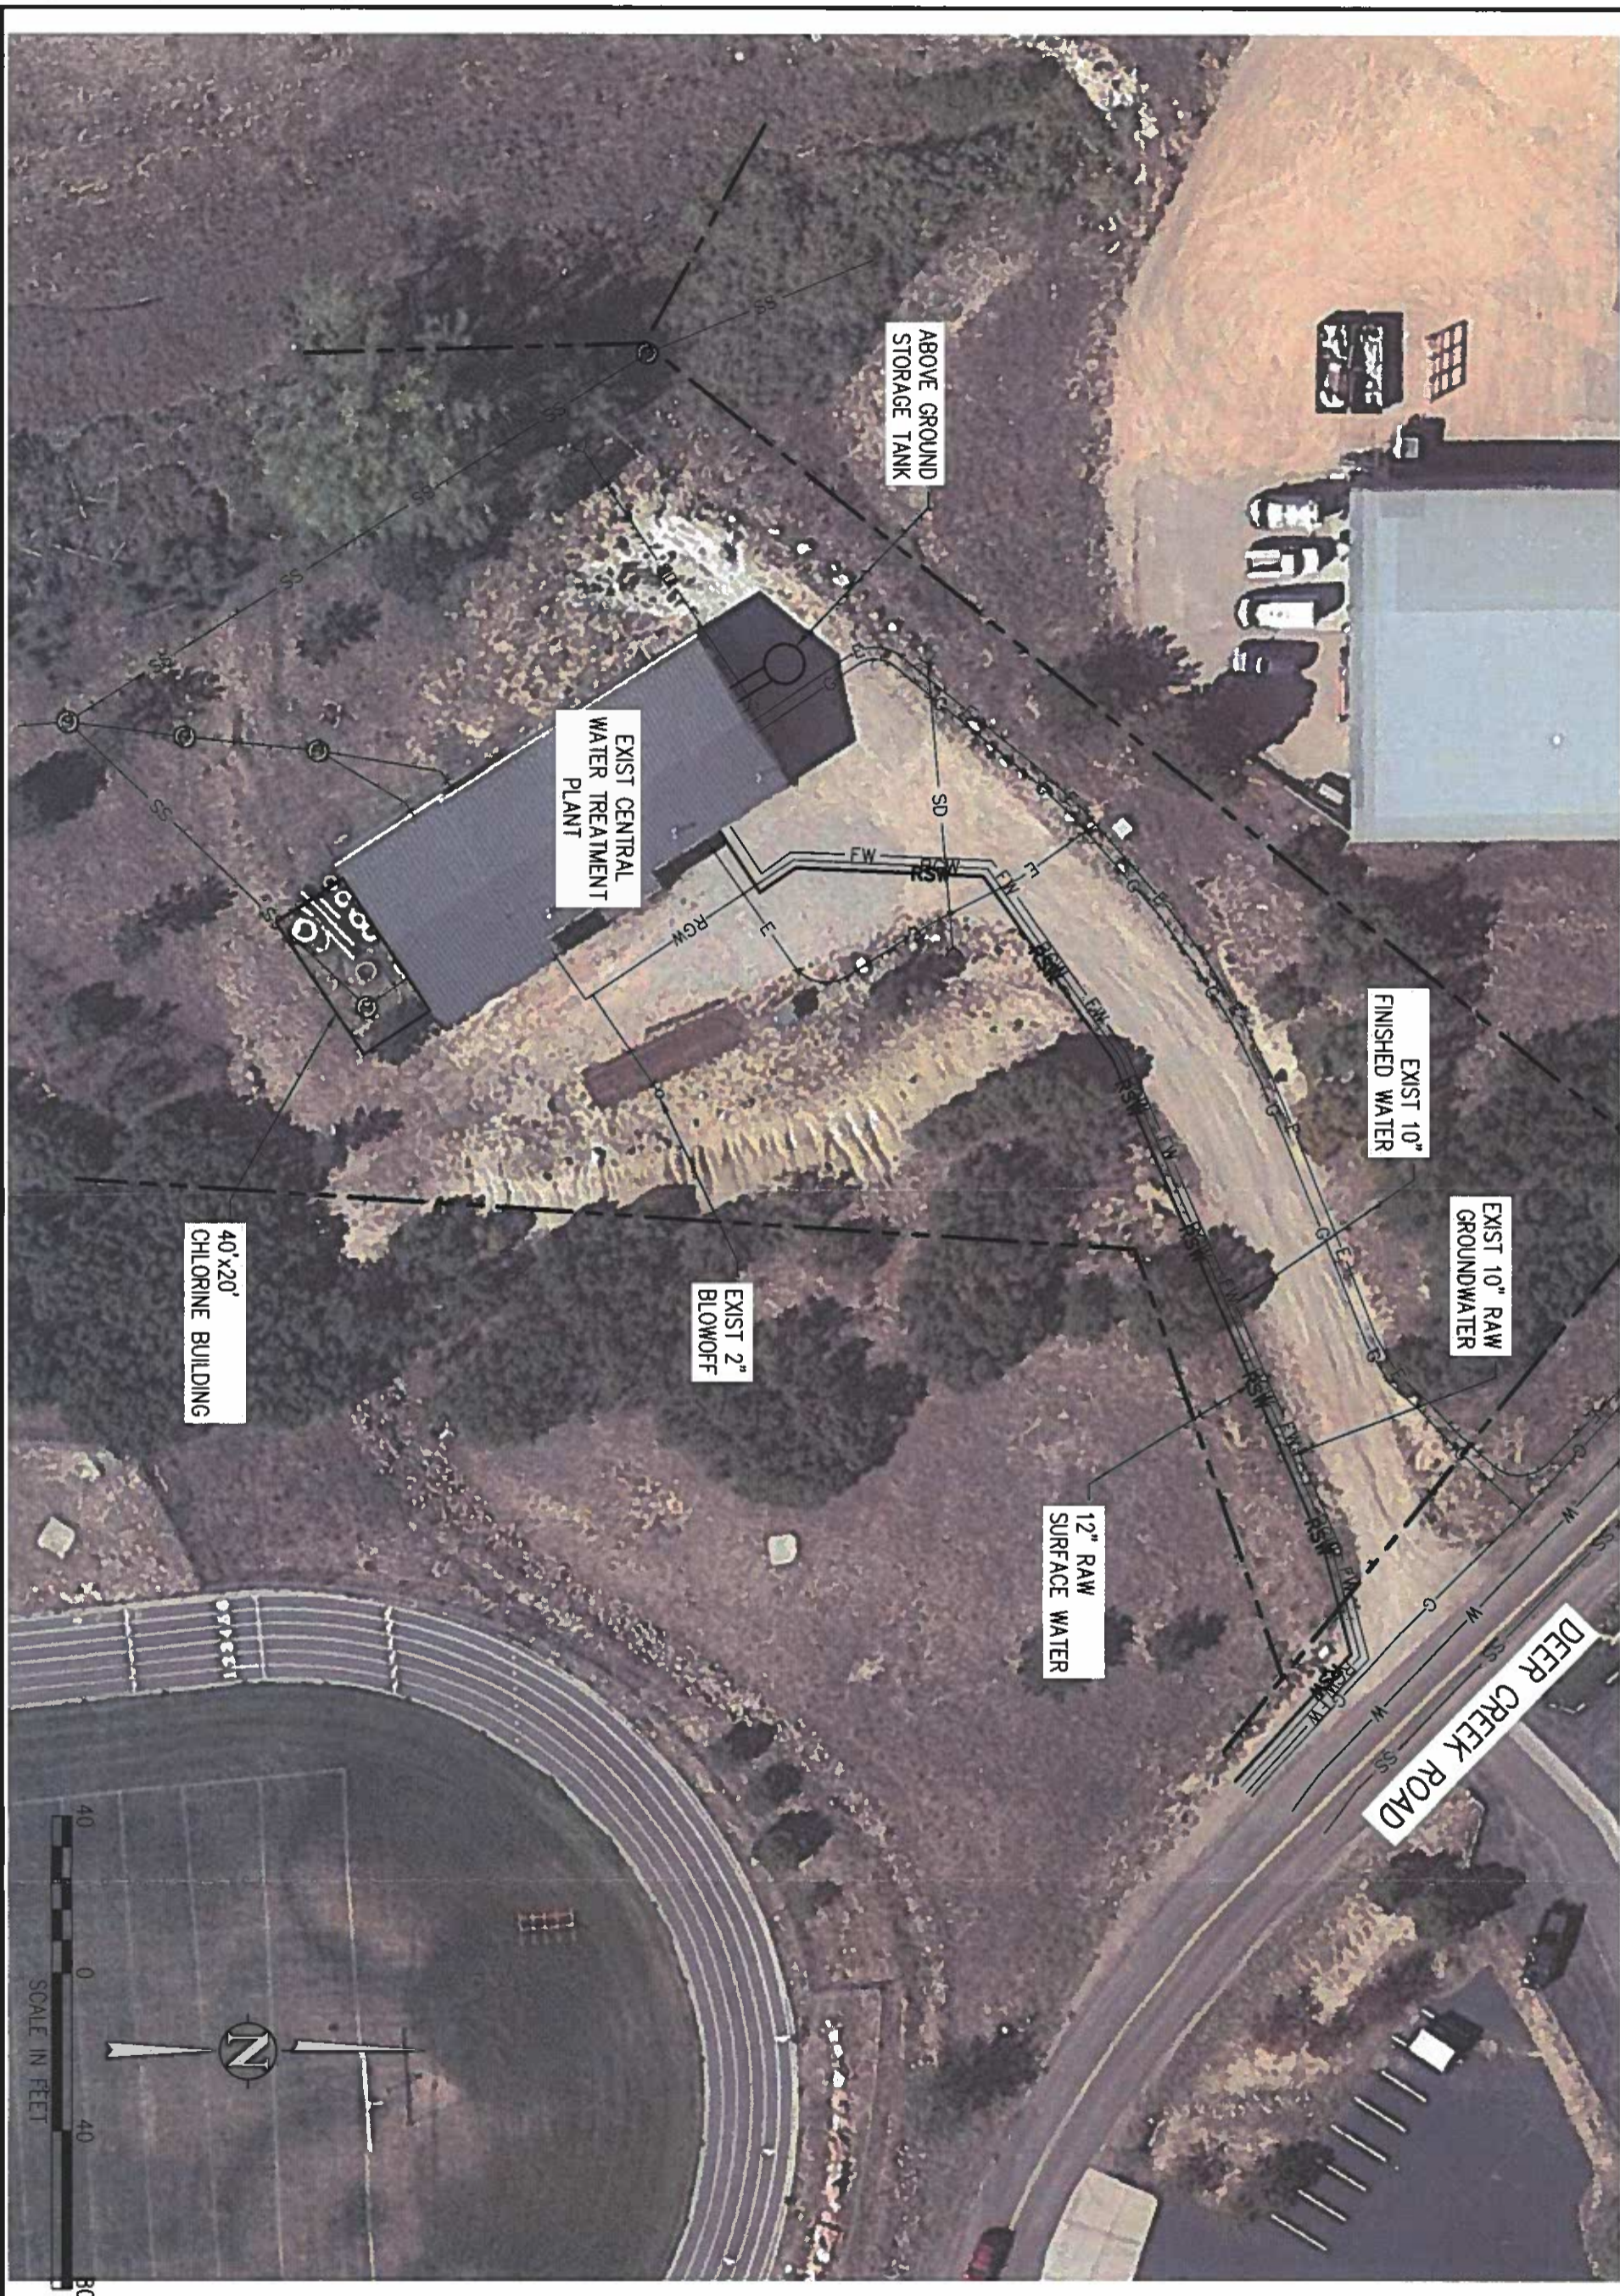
PRETREATMENT ALTERNATIVE NO. 3
